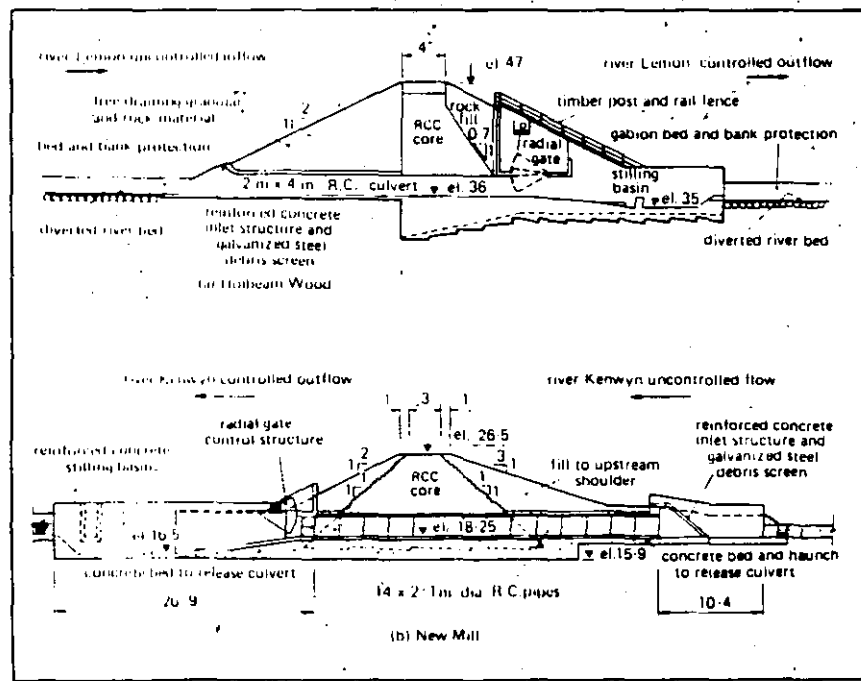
Schematic cross section through the RCC core and release culverts for: (a) Holbeam Wood; and, (b) New Mill dams.
